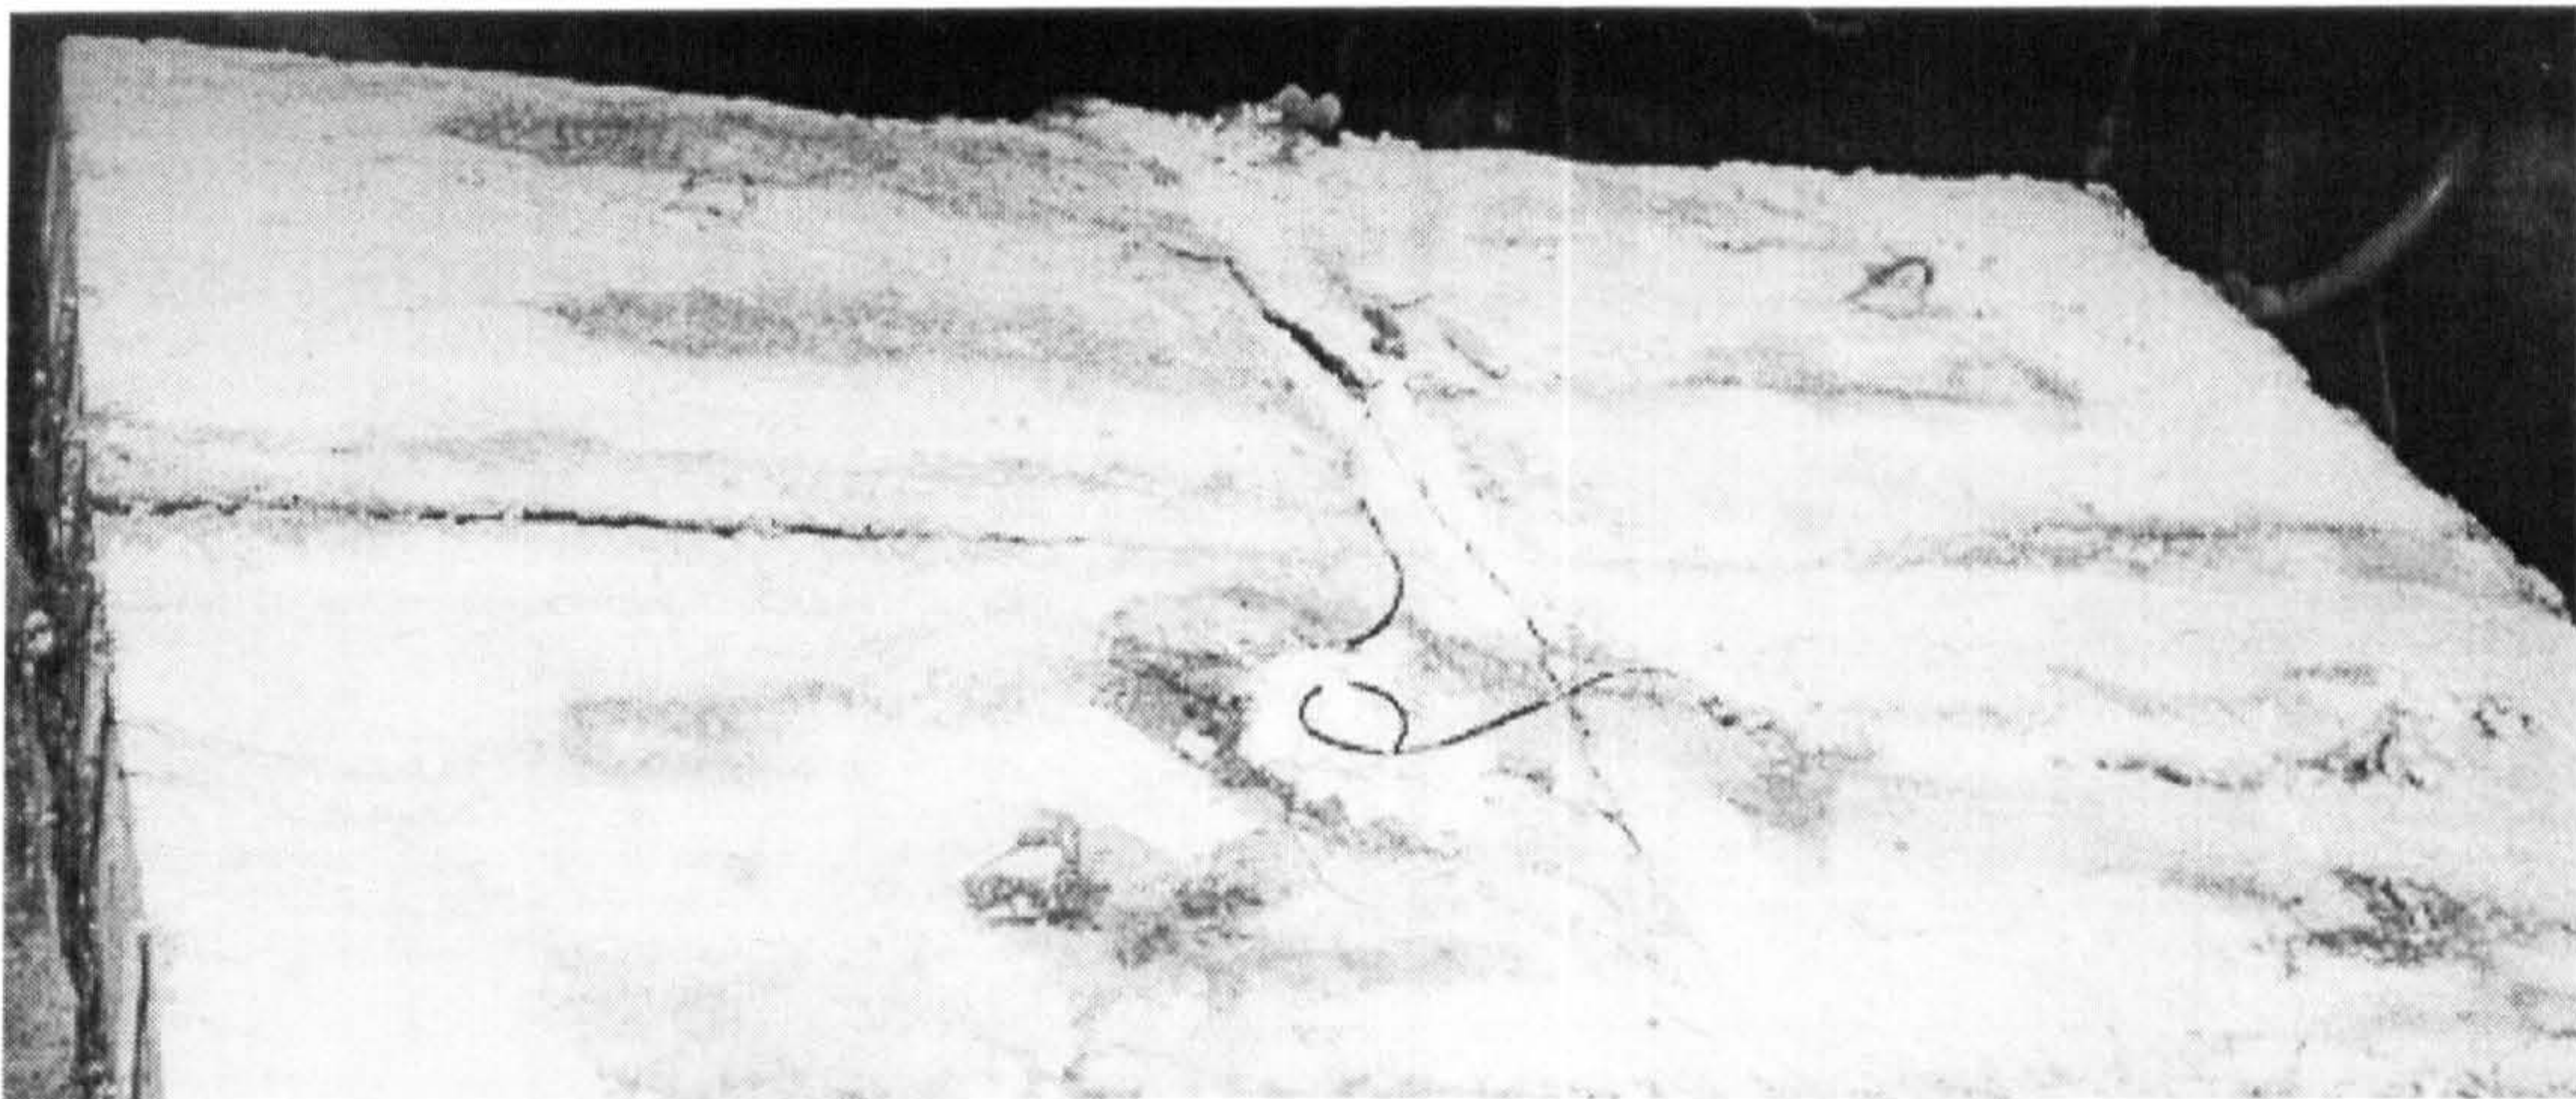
Crack pattern of T 10-C25-150-65 after the test
